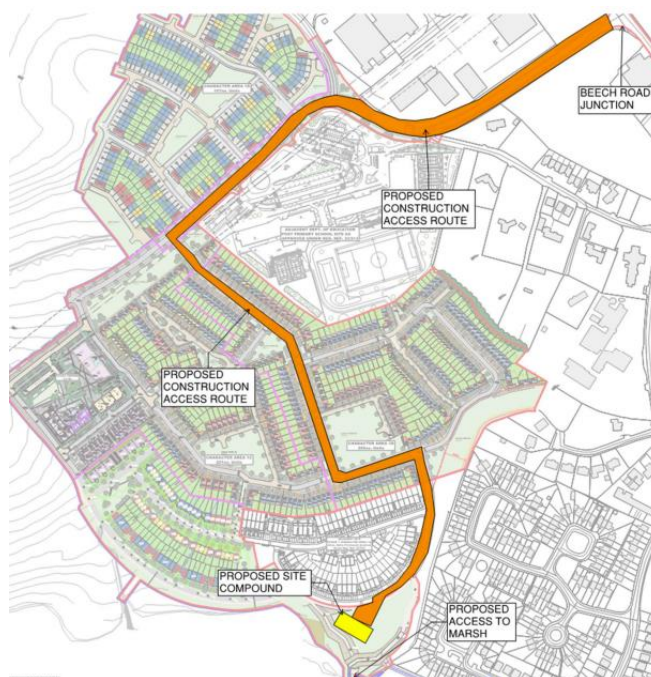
Temporary Site Access to Marsh (Source: DOB Consulting Engineers)
